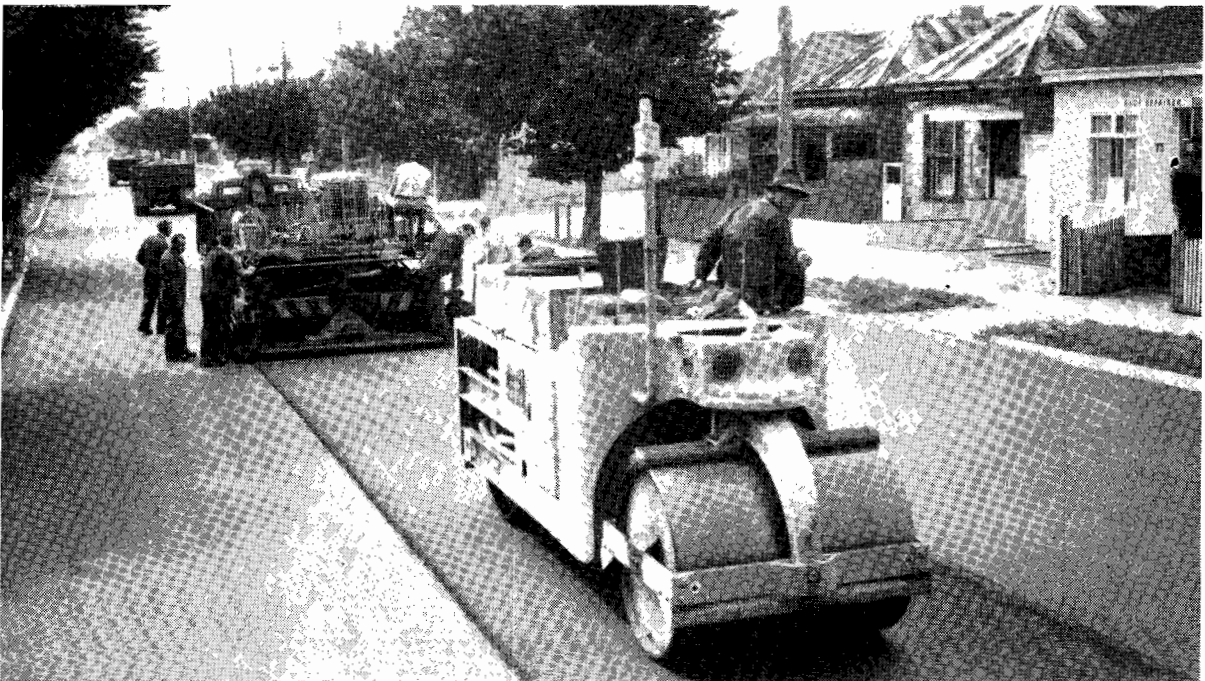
Ballarat Road near Rosamond Road. Channels reconstructed and asphalt laid, City of Sunshine.
